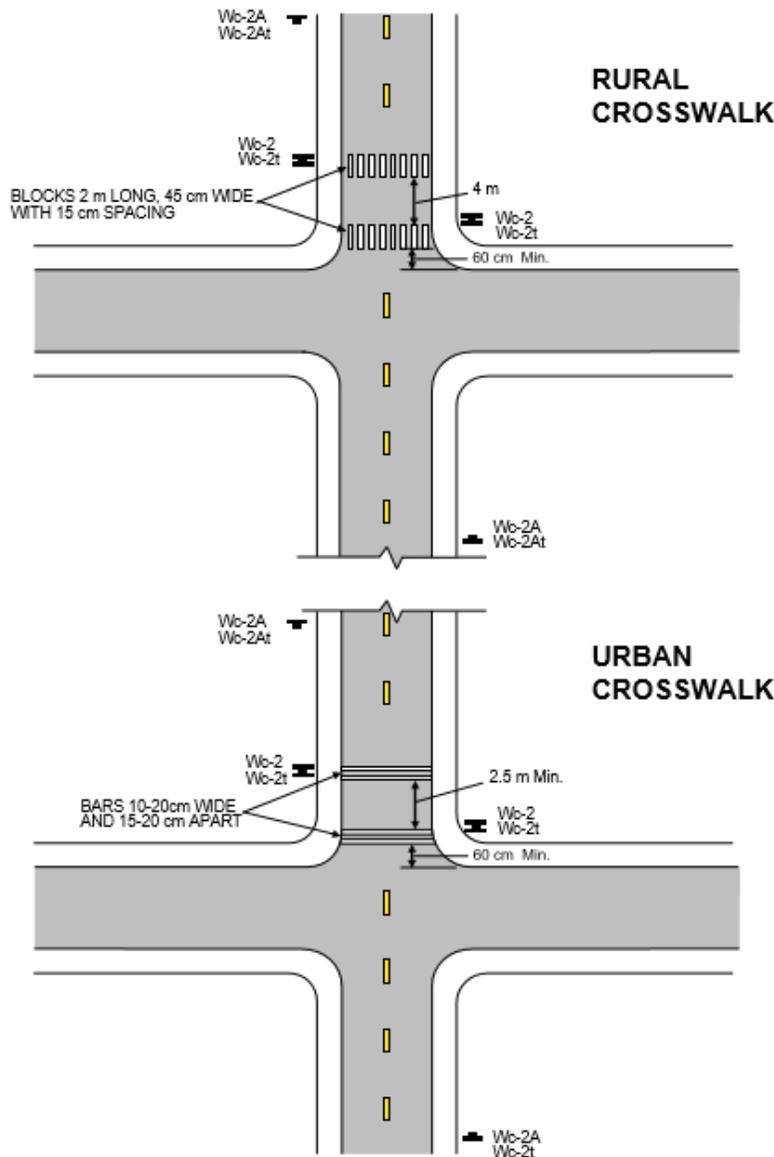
School Crosswalks for Supervised Crossing, OTM Book 11
